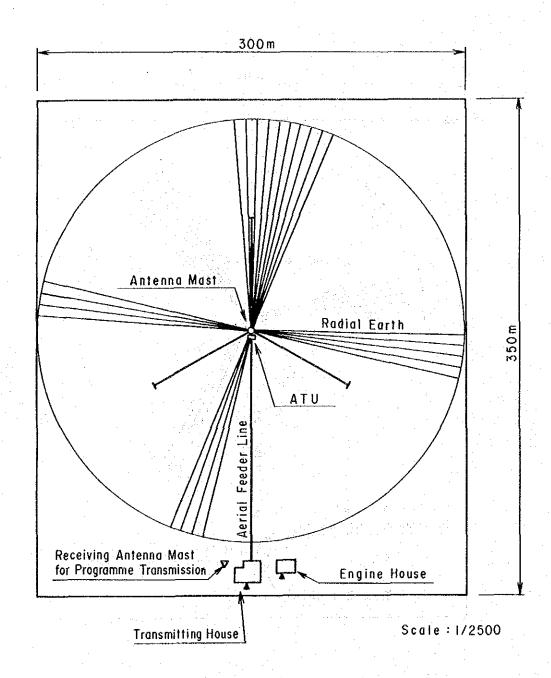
Fakfak Sorong Transmitting Station; Site Plan (New Site)
